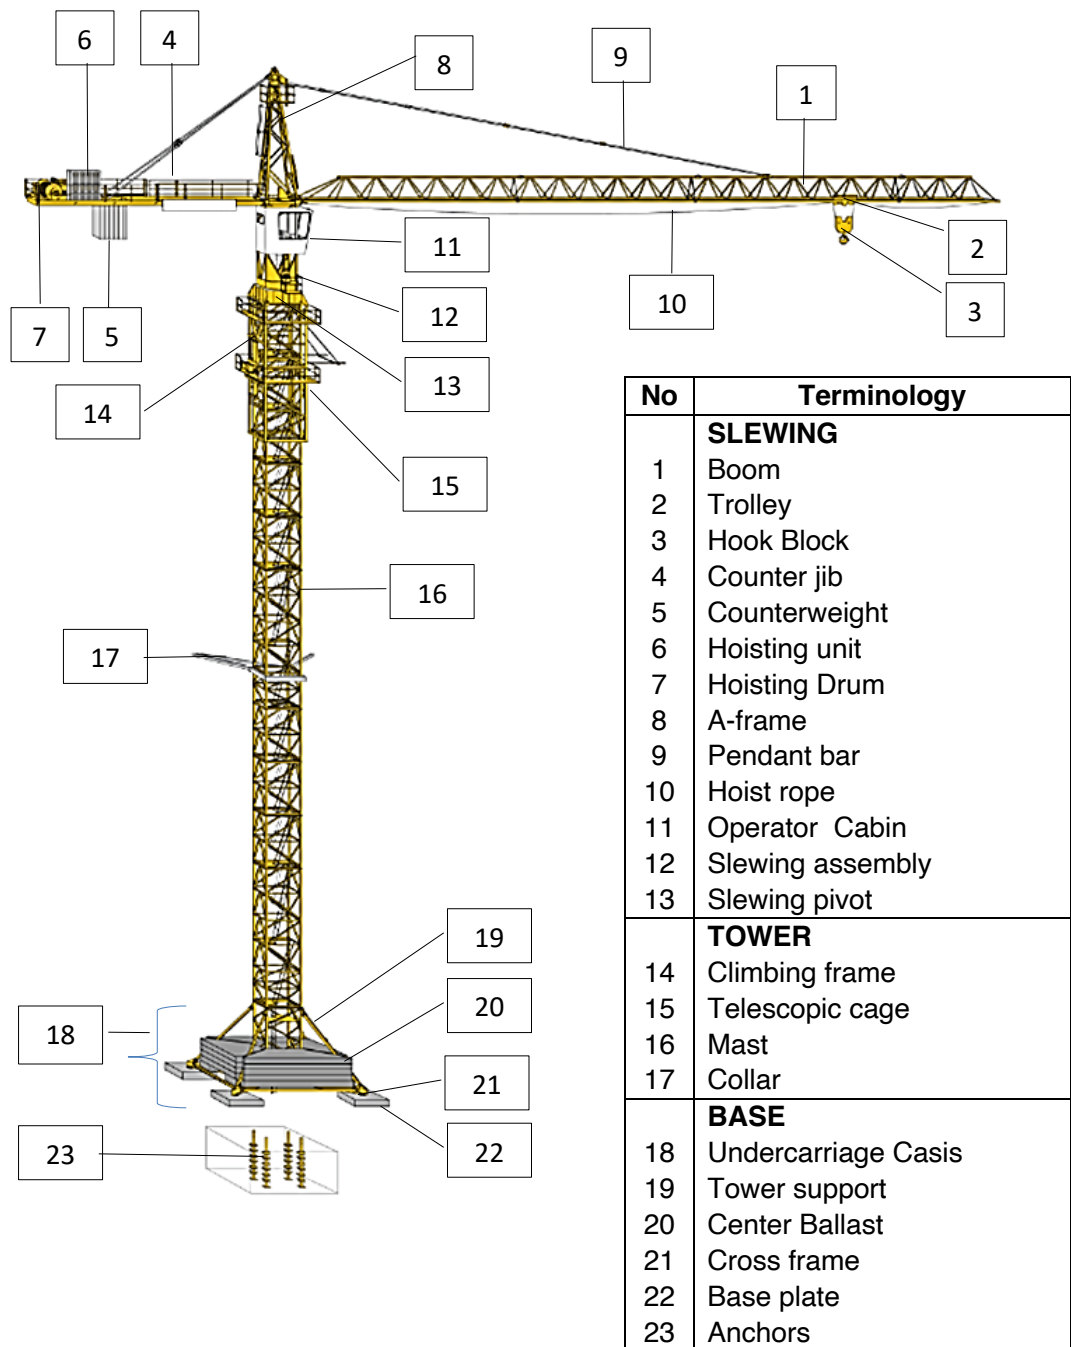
Design of a hammerhead tower crane (saddle top)
